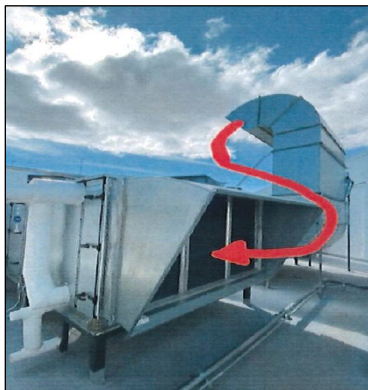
Initial inlet and outlet pipe HVAC system arrangement installed in the building and possible radioactive gas trajectory entering production main floor.
